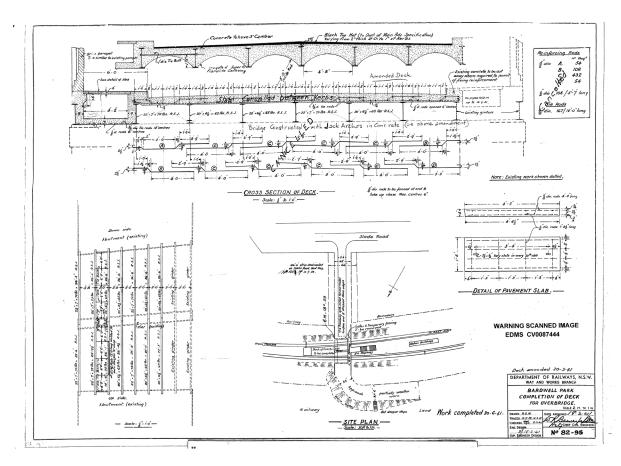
Bardwell Park completion of deck for overbridge, c. 1941 (Virtual Plan Room).
